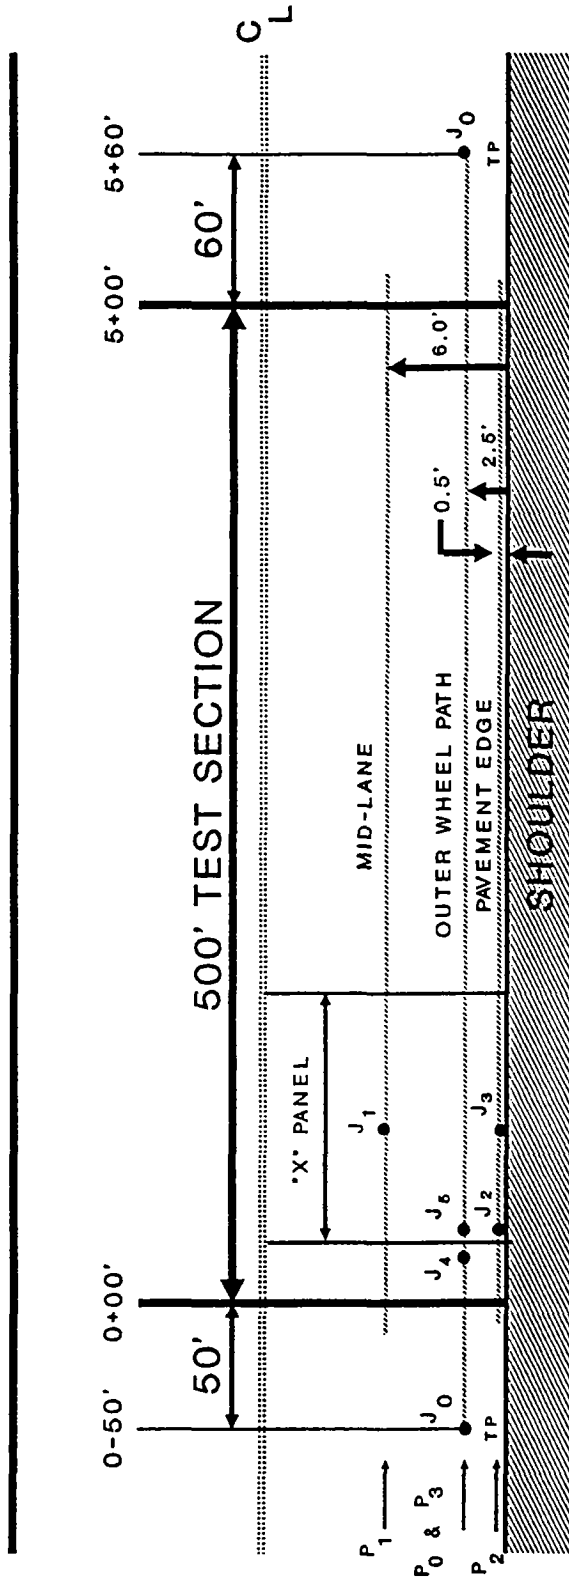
FWD TEST PLAN (FLEX PAVEMENT CATEGORIES).
